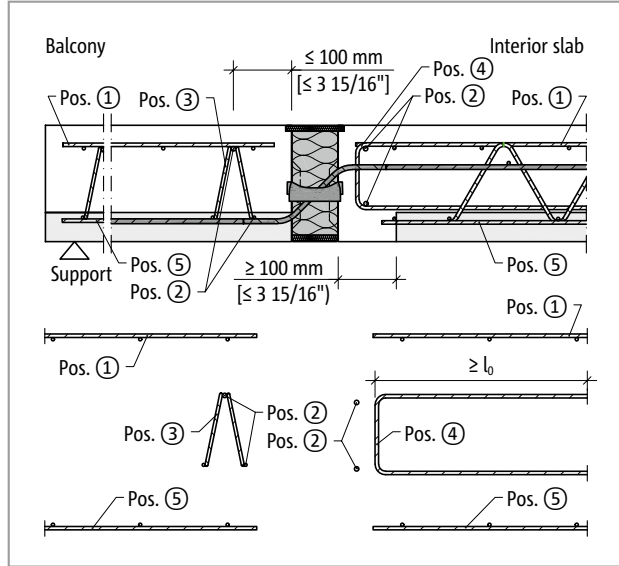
Schöck Isokorb® T Type CQ-V6 to CQ-V10: On-site reinforcement with lattice beam
